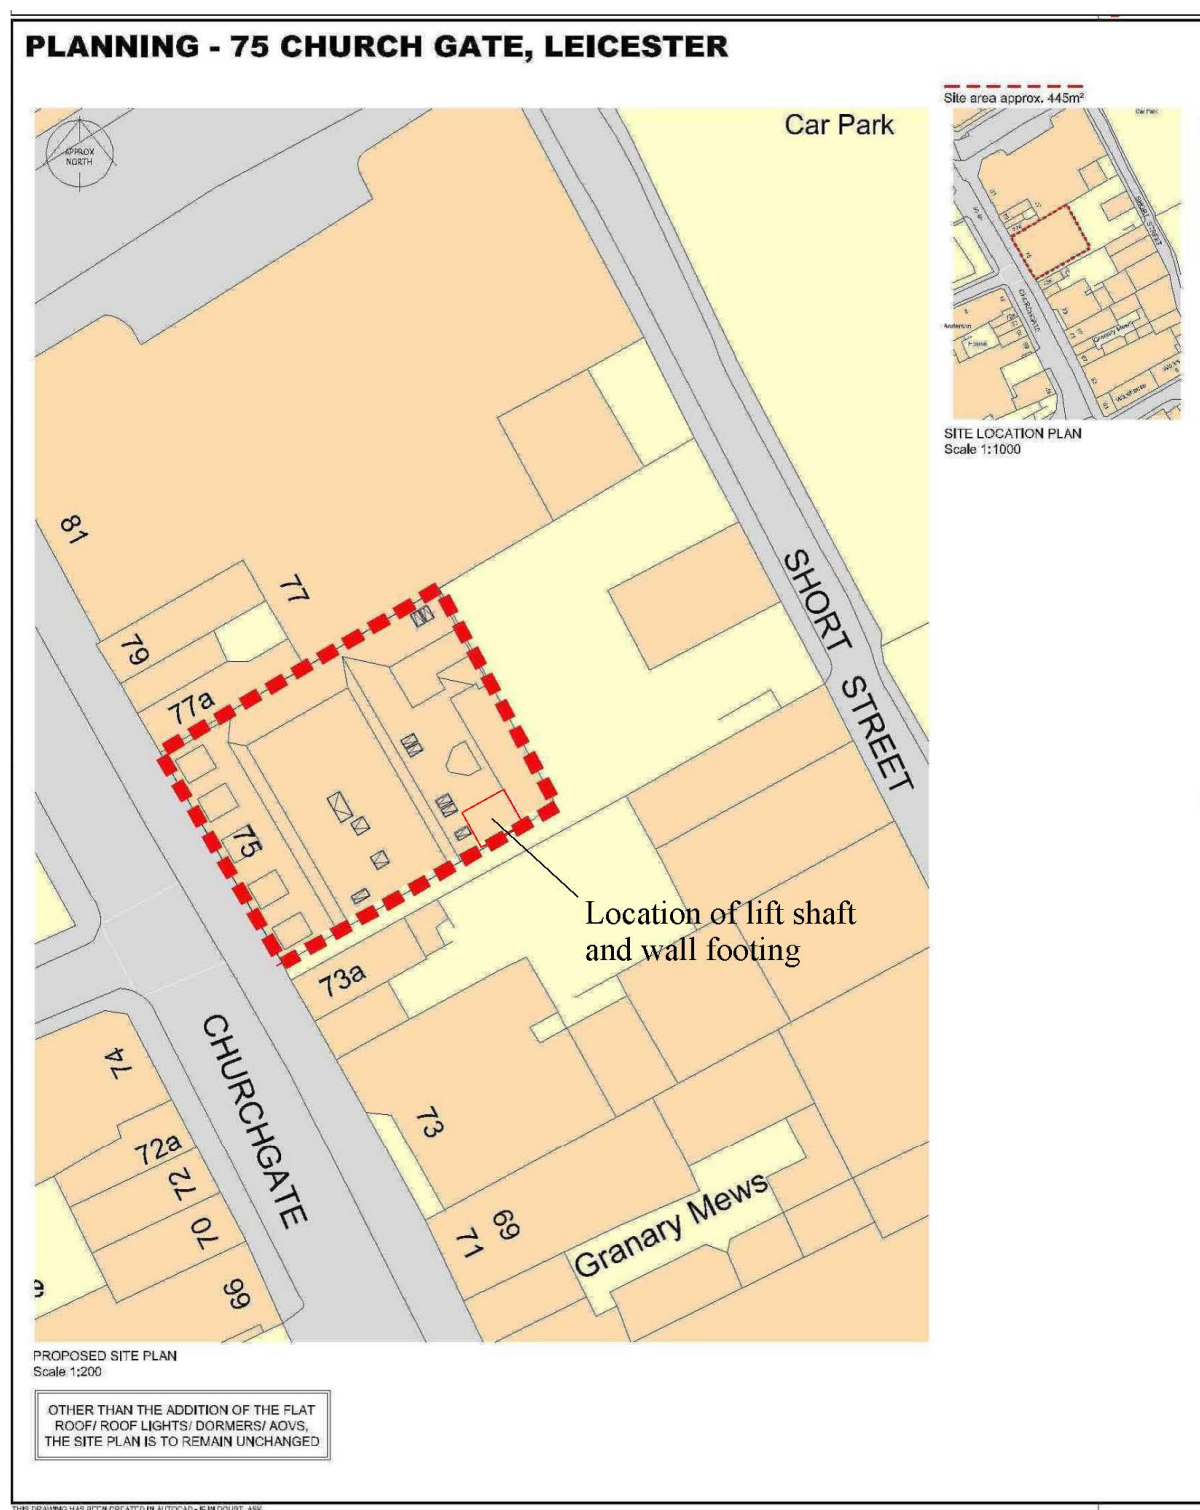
Location of the lift shaft and wall footing within 75 Church Gate (Adapted from client).
